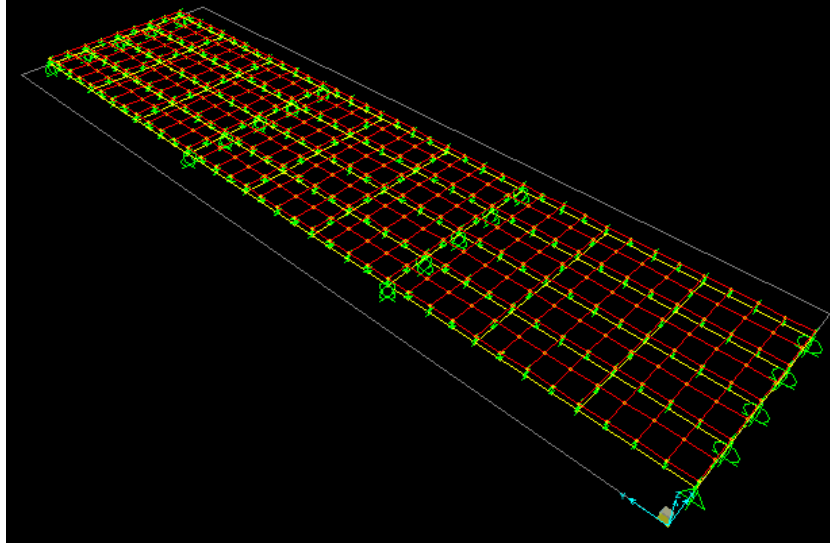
SAP2000 model of the Noyes Slough Bridge
